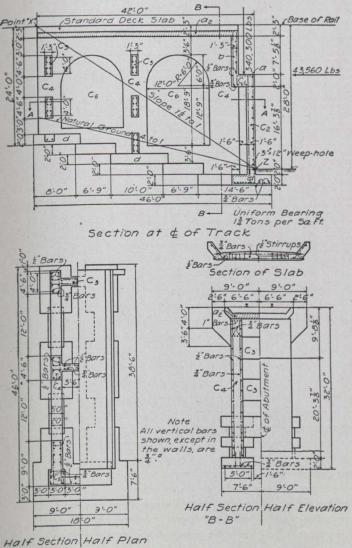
Type C<sub>2</sub>; Reinforced Concrete U Abutment Filled; Long Sidewalls.
